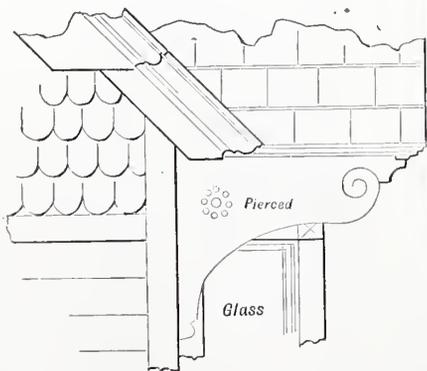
Finish of Front Corner of House at Line of Eaves.—Scale, 3/8 Inch to the Foot.
